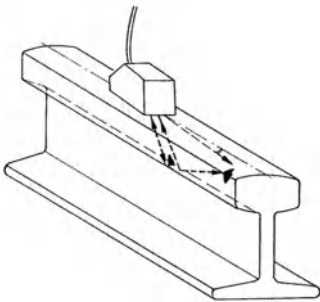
Testing of rails for incipient cracks at the lower edges of the head
